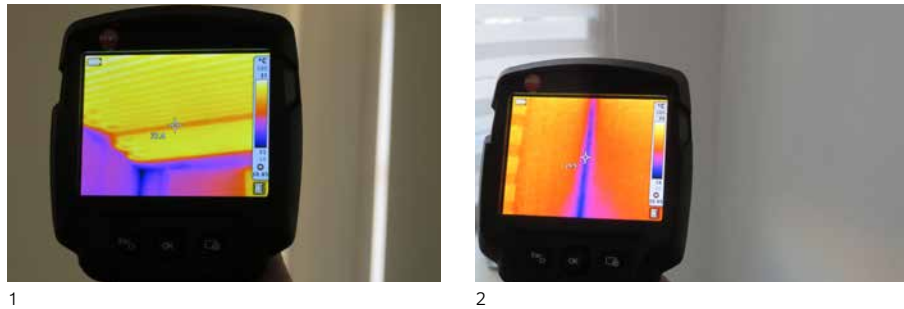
Infra-red imaging of the heating installation in the ceiling and of corners of an exterior wall of an apartment in the Koningsvrouwen van Landlust housing complex. (2016).
